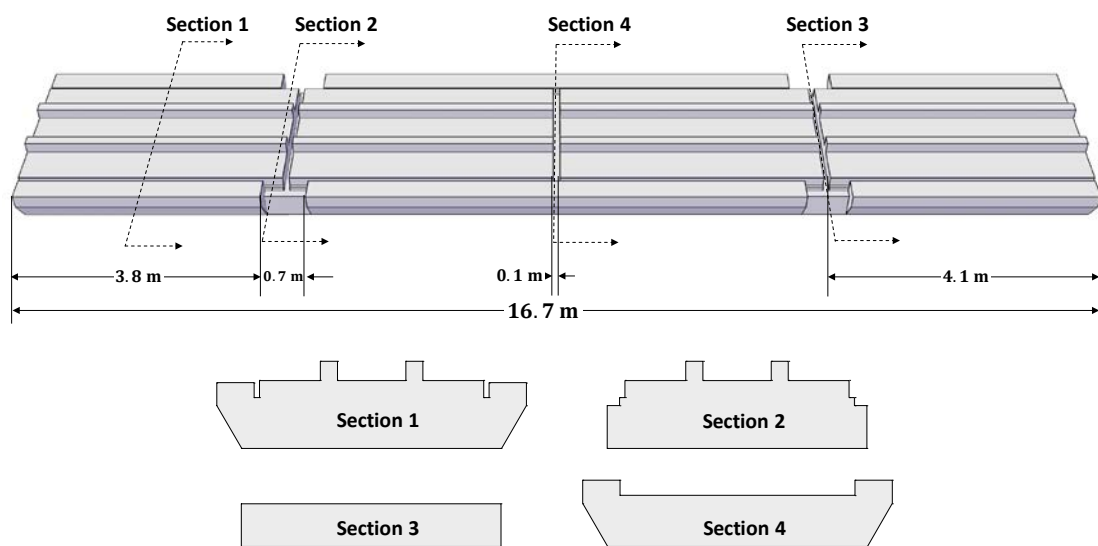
Dimensions and cross-sections of the concrete slab of the mockup track.
